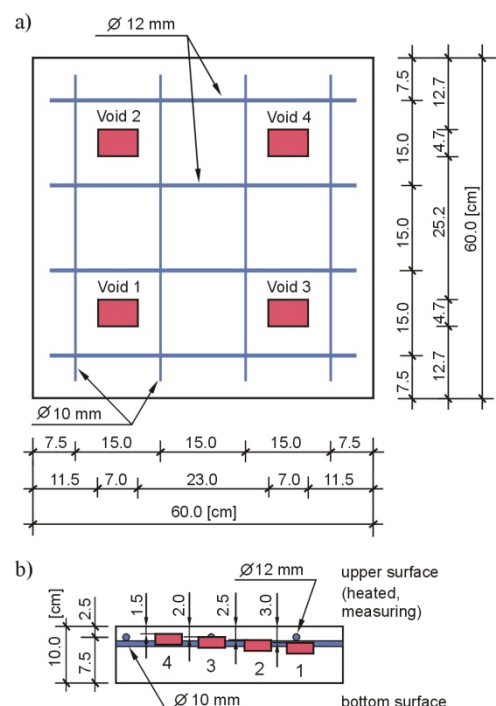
Geometry of the reinforced concrete (RC) plate: a) reinforcing bars and “defects” layout, b) schematic position of voids in plate
